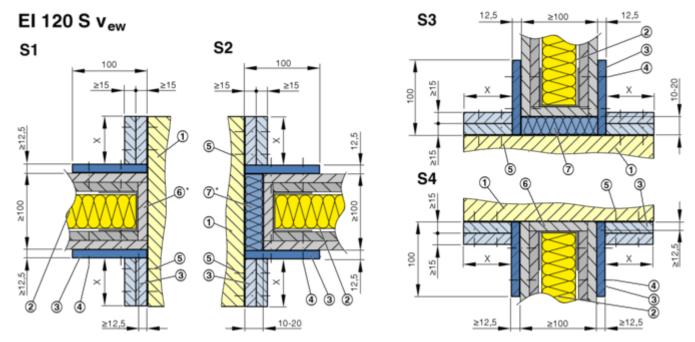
Details EK-JZ Dry mortarless installation in solid wall, solid shaft wall EI 120 S, legend & Fig. 43
